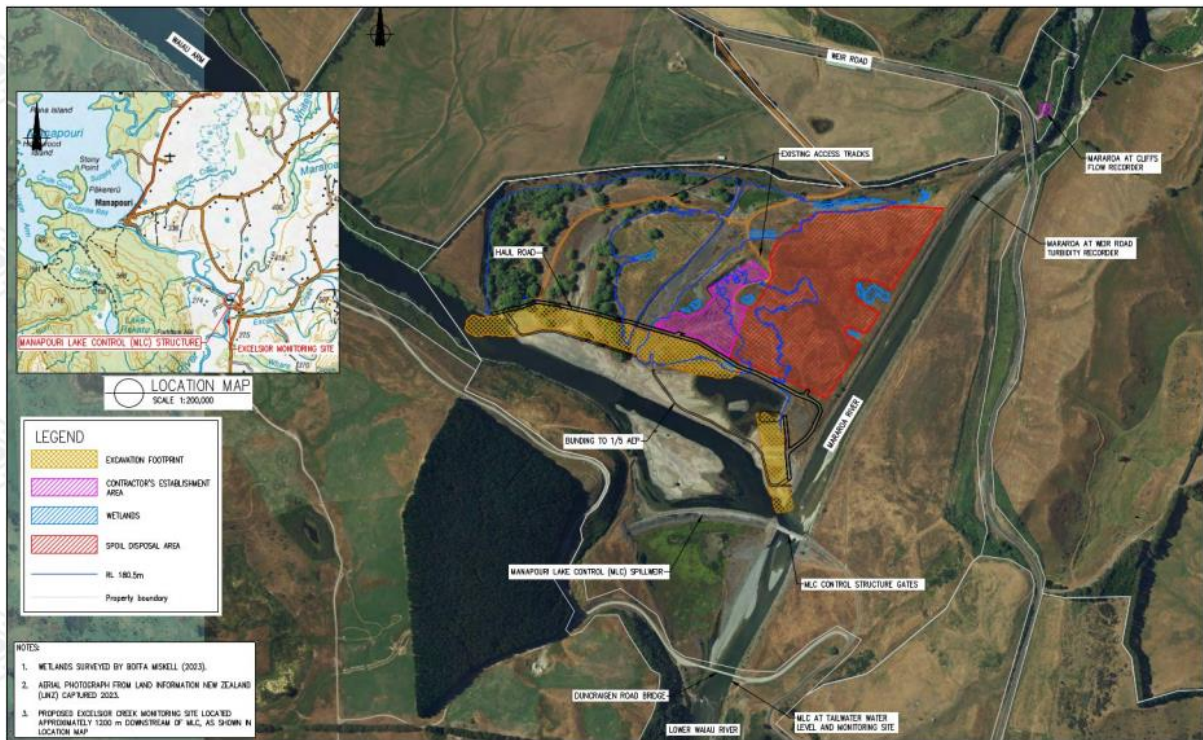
Proposed construction channel, establishment area, current wetlands and spoil disposal area.²
